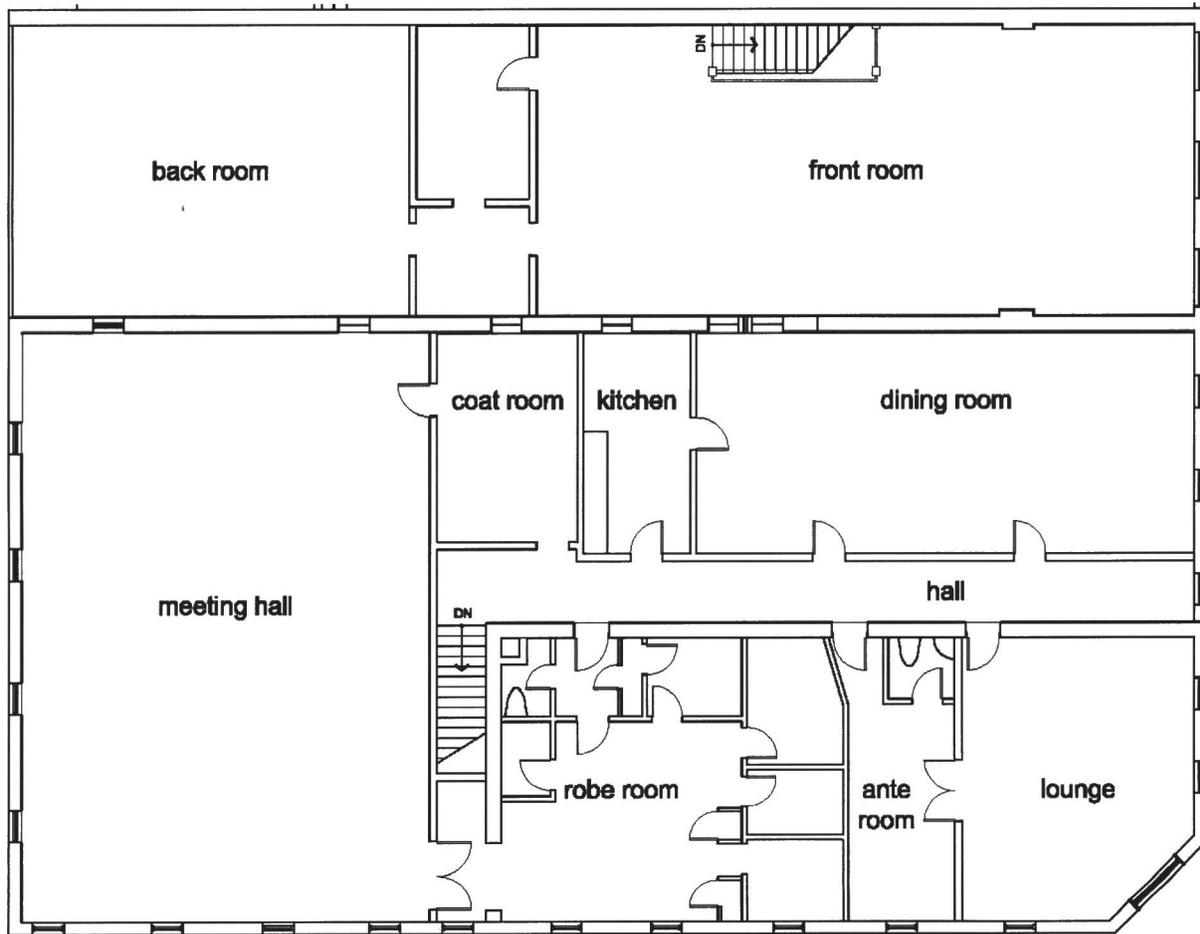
Second Floor Plan Pre-Rehabilitation – Plan by APMA March 2010 – not to scale.
